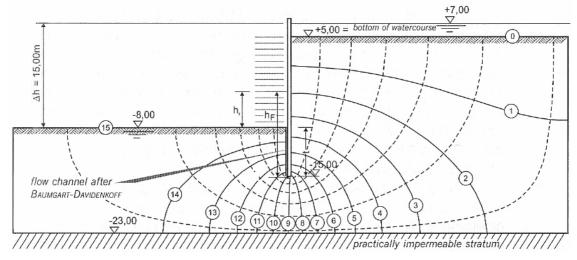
Hydraulic heave by Baumgarten-Davidenkoff method
